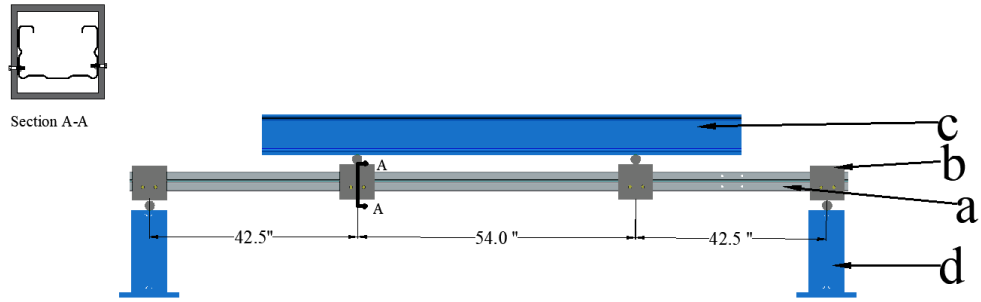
Elevation view of minor axis (LIC) test setup schematic: a. specimen, b. $7 \times 7 \times 1/2$ HSS sections, c. spreader beam, d. end support beam
